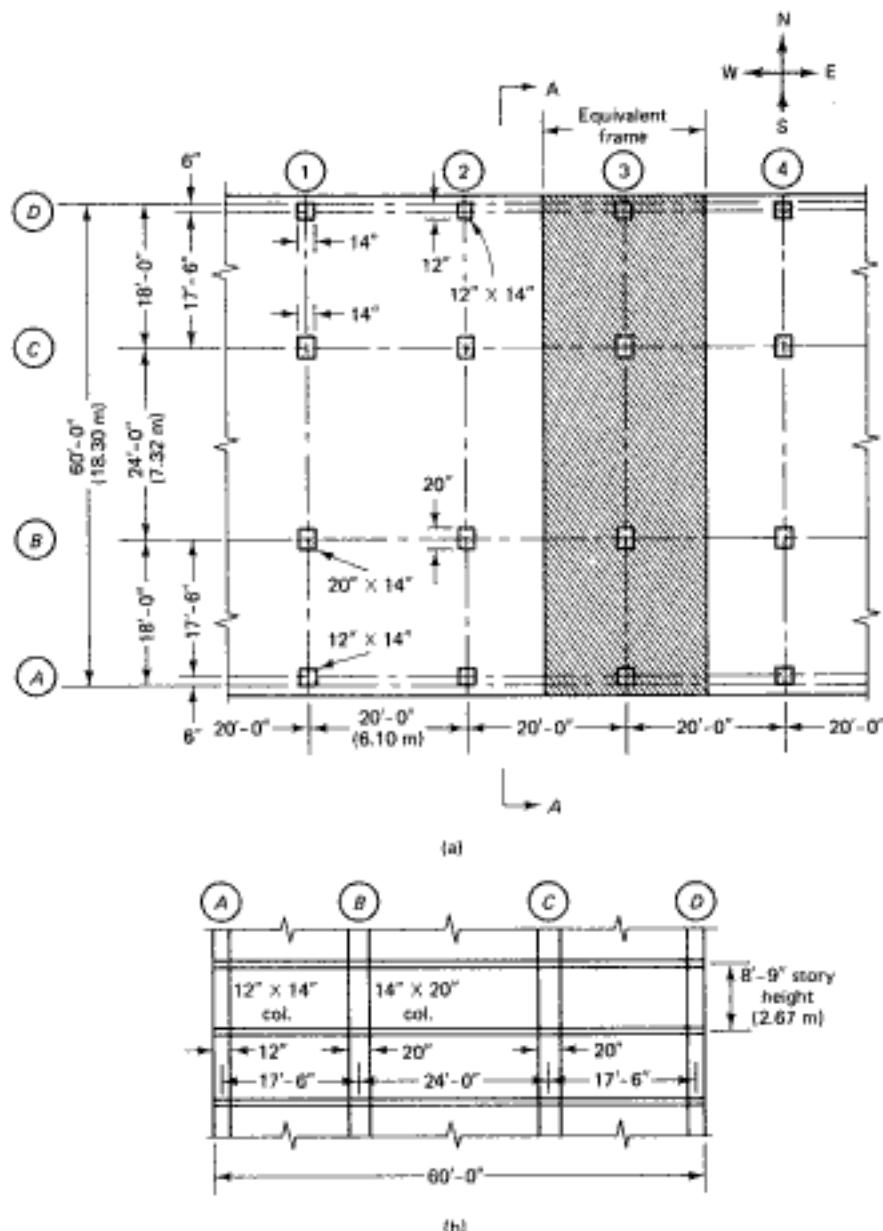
Flat-plate apartment floor system (a) plan; (b) section A-A, N-S.
